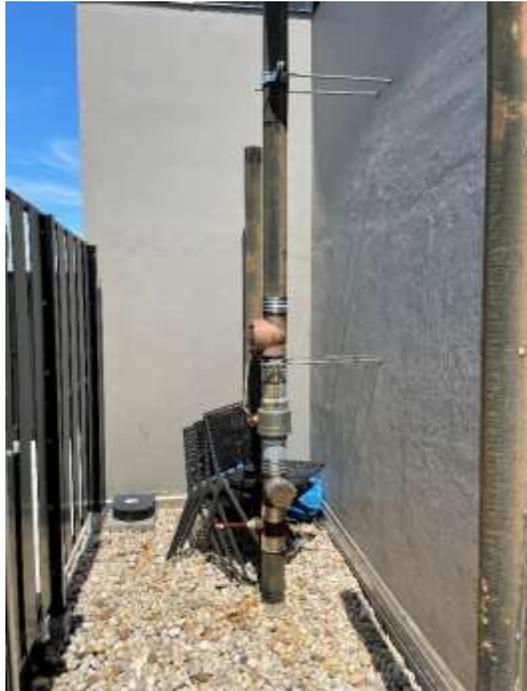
V6 riser and sample port in good condition, facing northwest. 20 June 2022.
